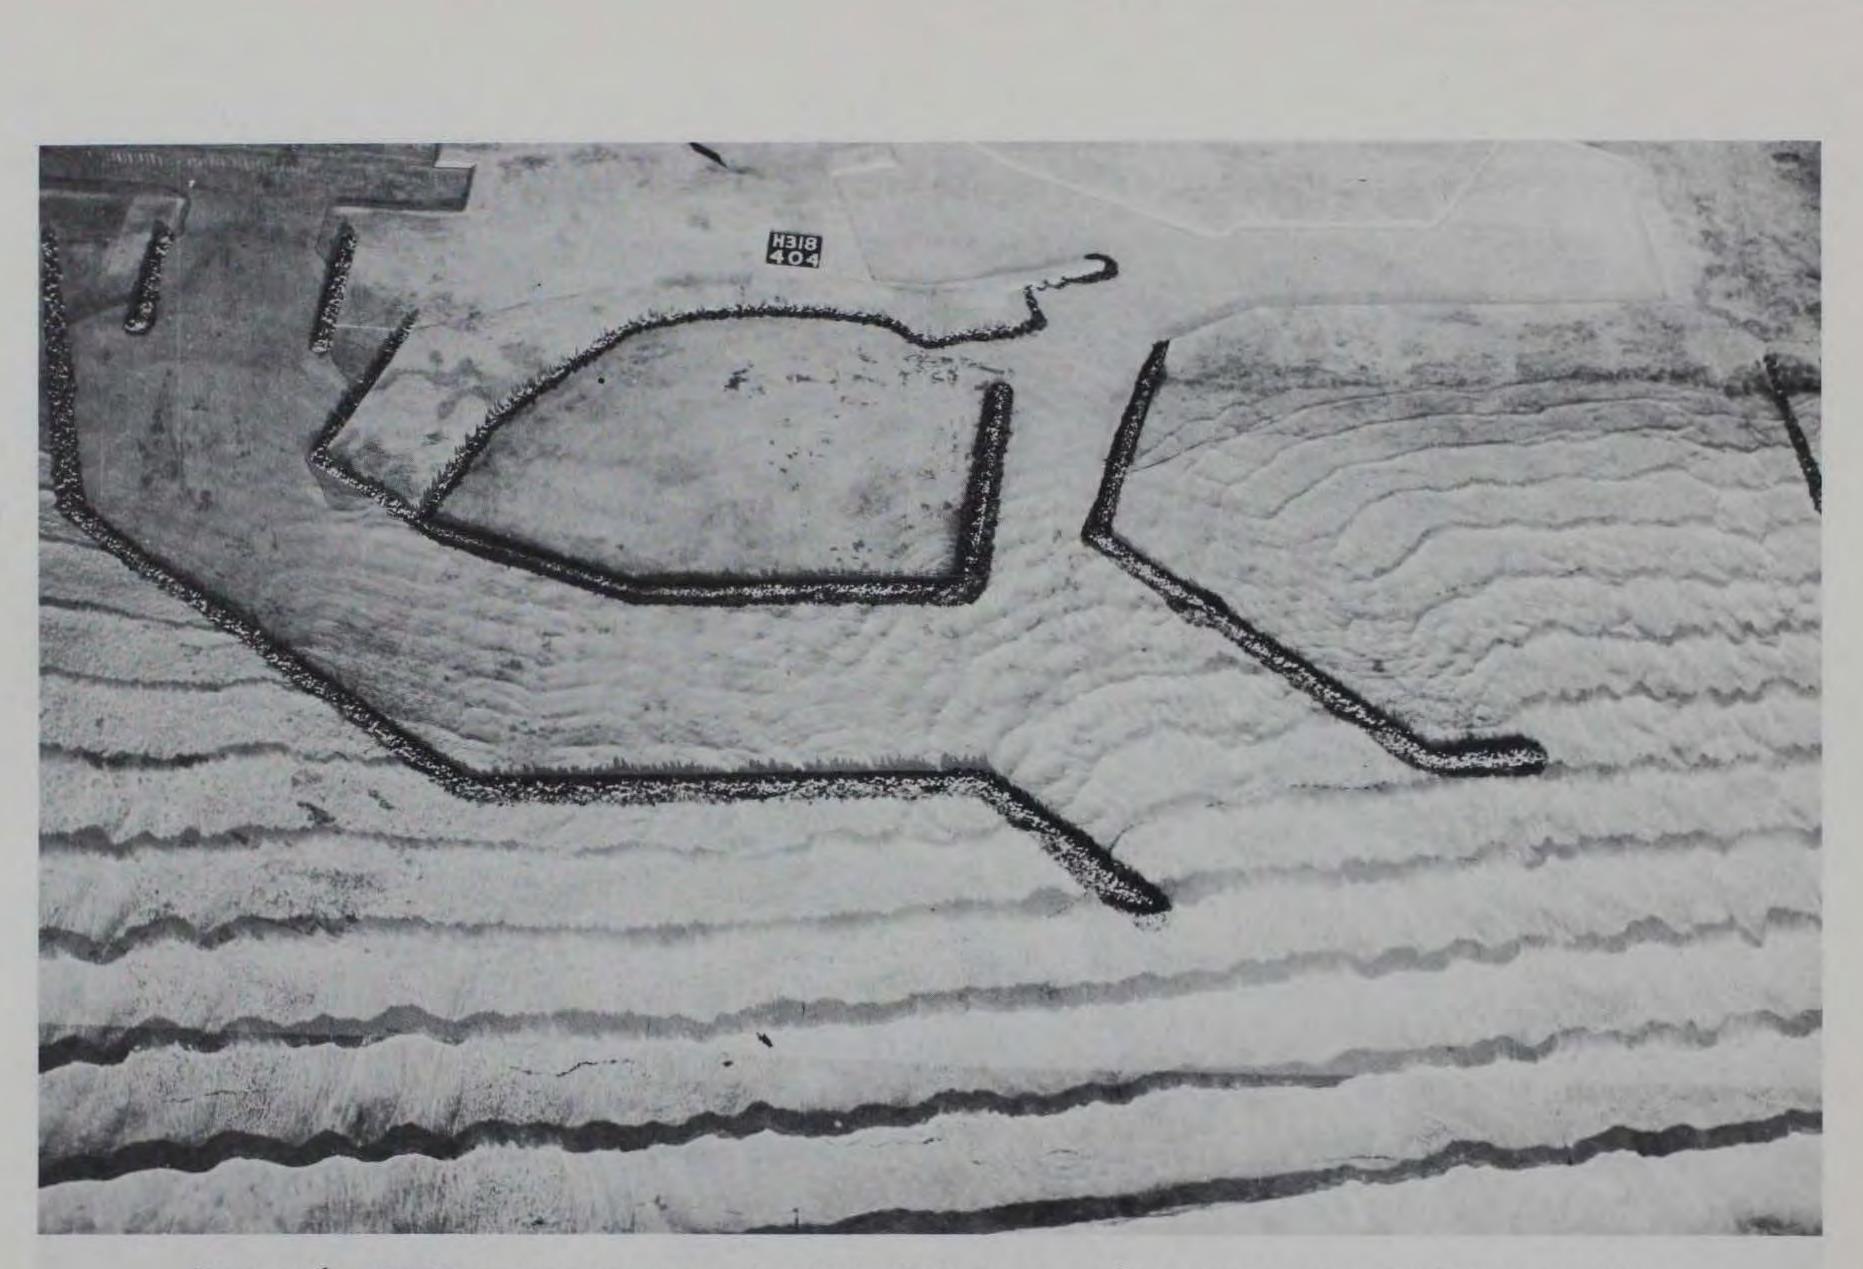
Typical wave patterns for Plan 21F; 9-sec, 16-ft waves from southwest at mhhw
